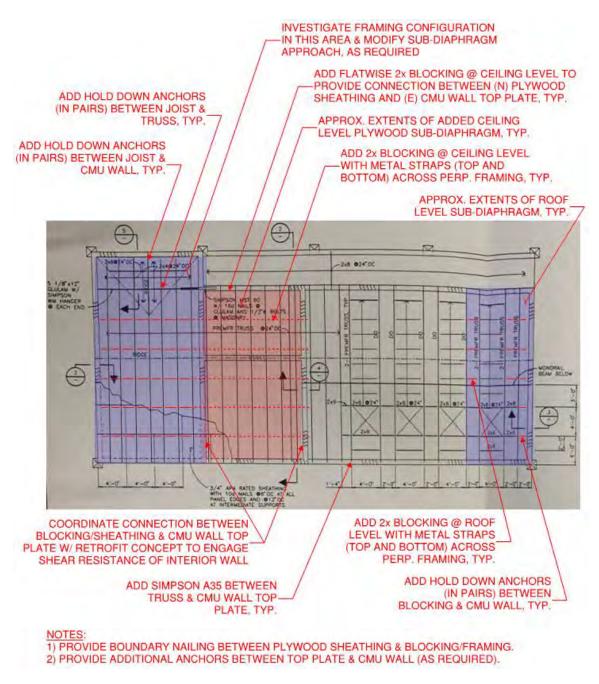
Sub-diaphragm Retrofit Concept (Adapted From: Detail 1 on Sheet S4 of 1994 design drawings by KMC, Inc.)
